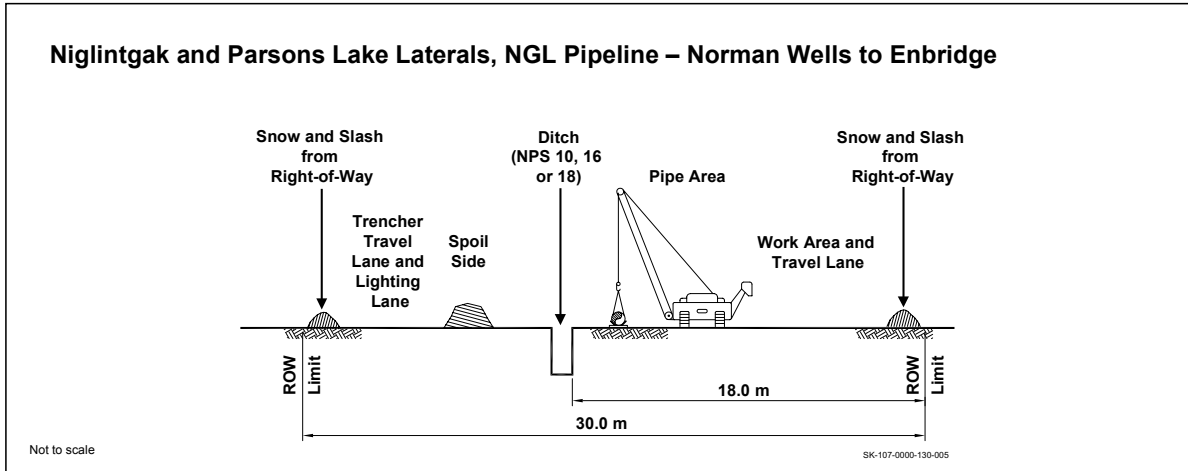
Typical Right-of-Way Layout for NPS 10, 16 or 18 Pipe
